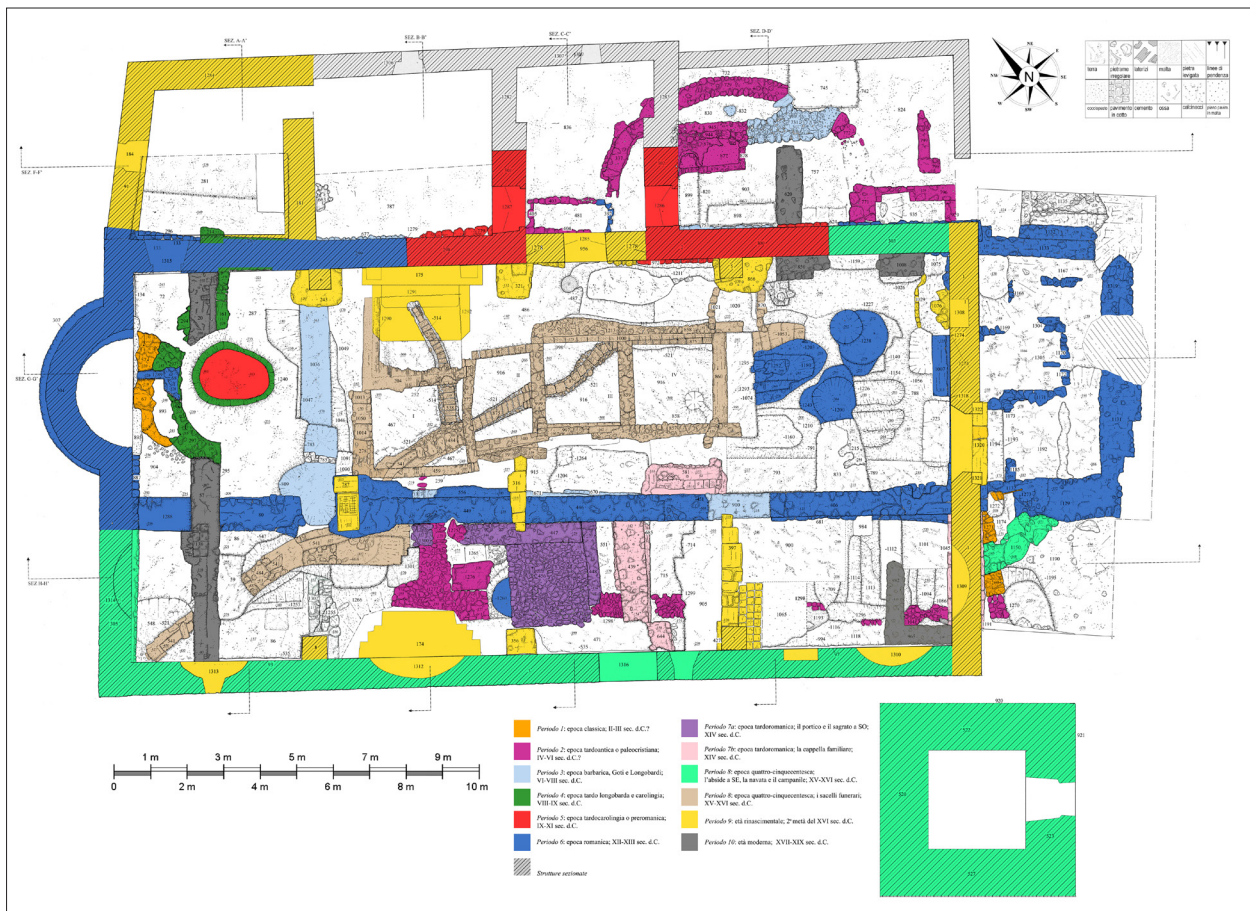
Barete, church of San Paolo, general plan of the excavation.
